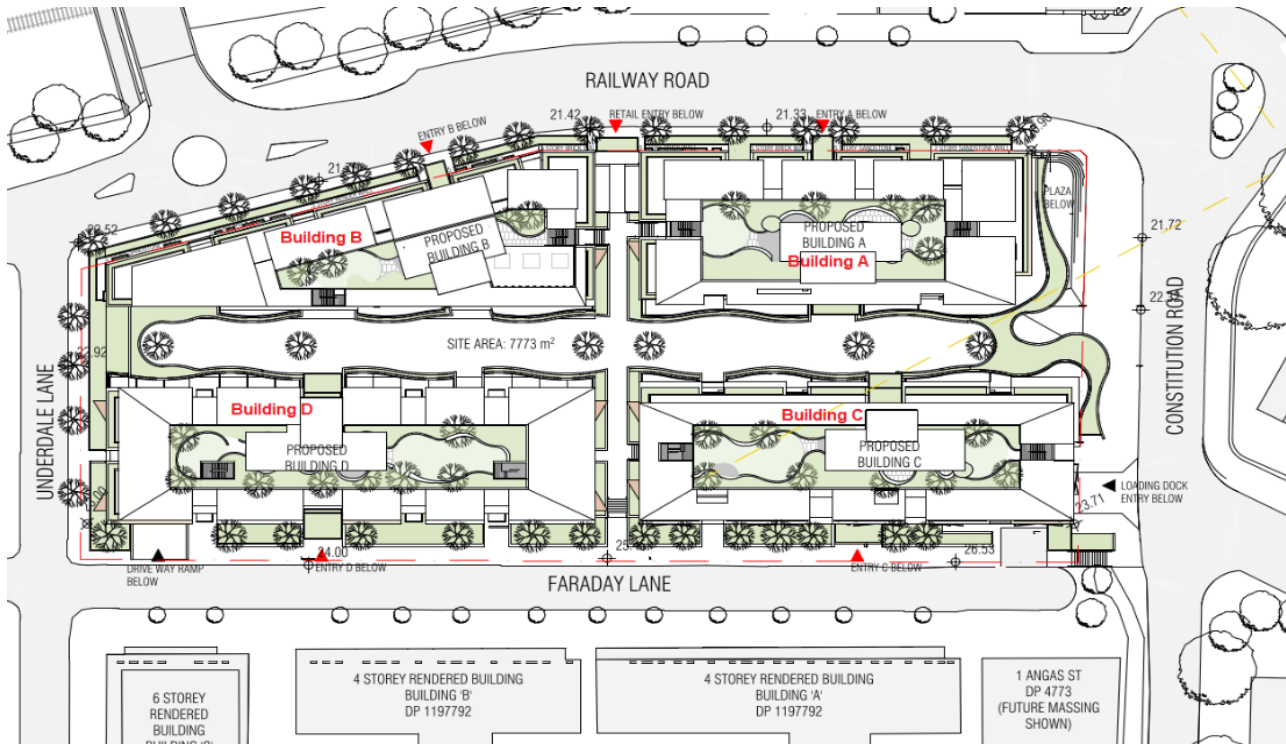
Plan showing the above view of the proposed development, showing the roof level and location of each of the buildings.
